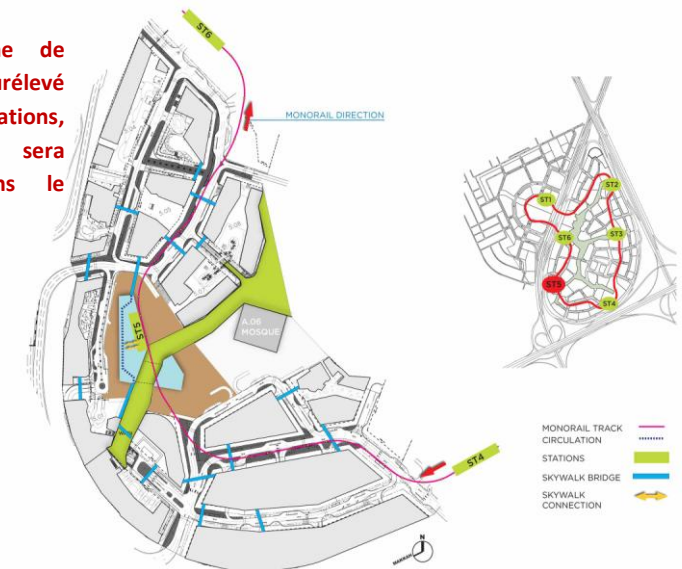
Monorail plan. / Source : <http://www.fxcollaborative.com>
